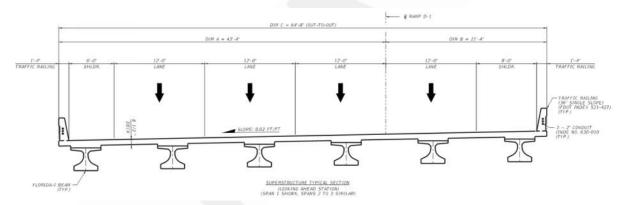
Bridge Typical Section (Bridge No. 13) 1 of 2
